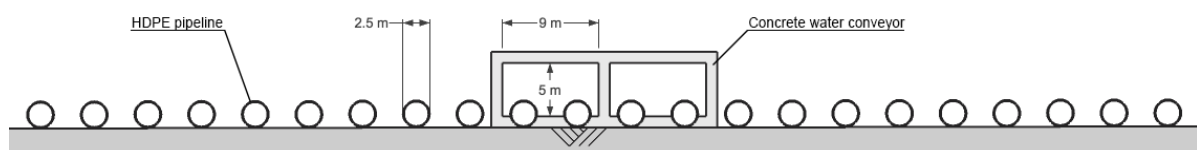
22 × 2500OD HDPE pipes or two 9 × 5 m concrete tunnels, both can transport the same amount of water.
